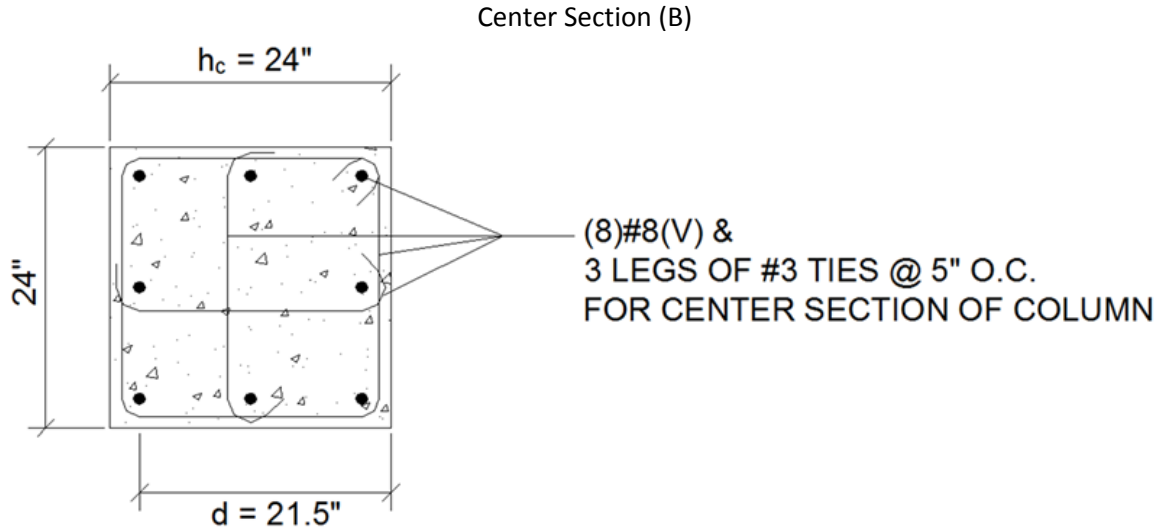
Interior column, center section cross-section for column at all floor levels based on SDC D design.
